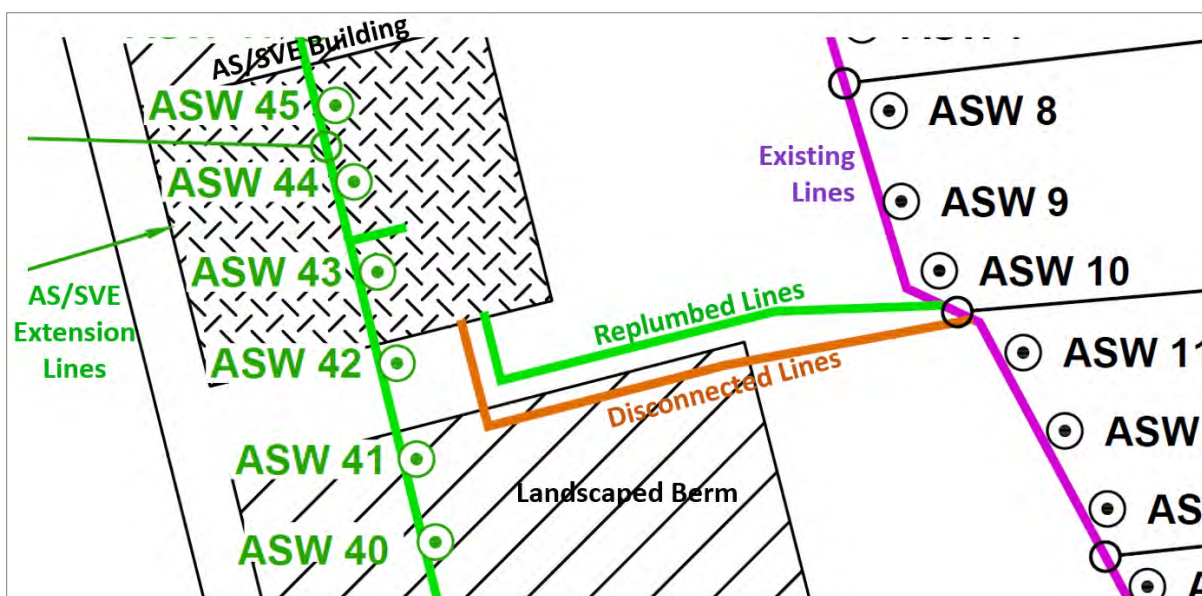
Replumbing of Existing AS/SVE Lines (North is Up)
